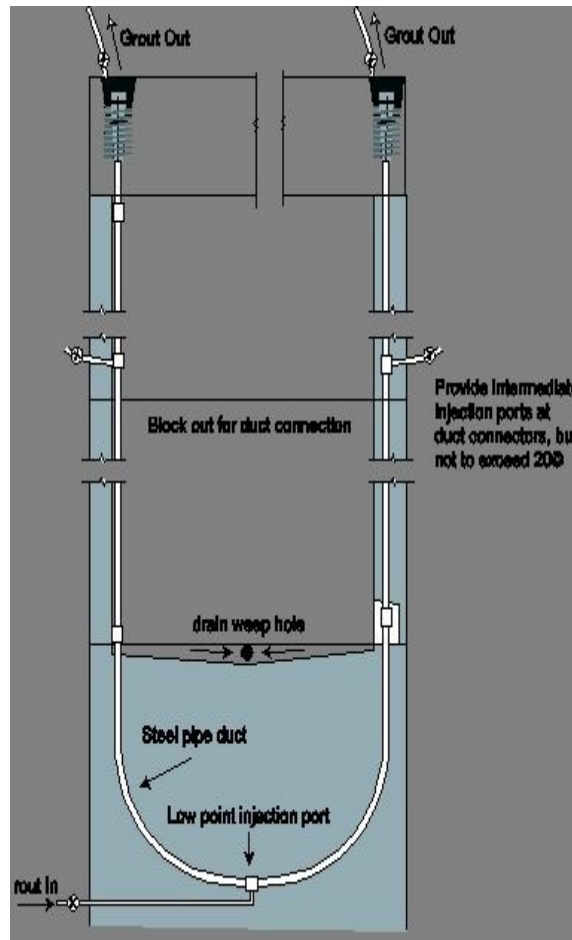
Grouting and anchor details for vertical tendons in piers
